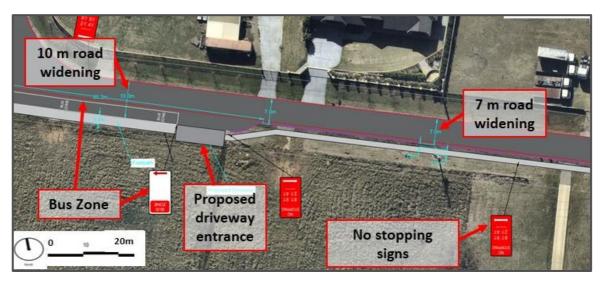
| Proposed diagram for road widening and footpath (Source: Applicant's EIS 2018)
